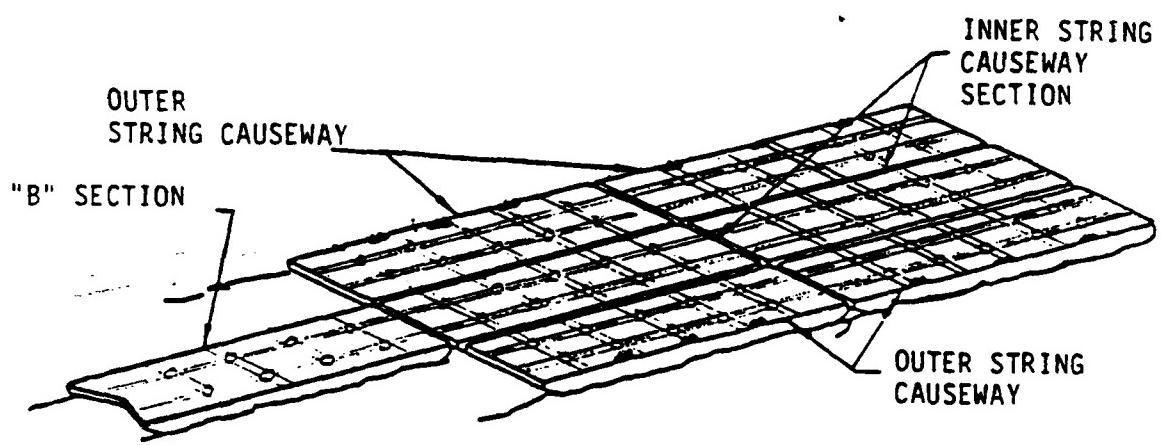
Causeway Platform ( 2 x 3 Configuration "B" Section)
